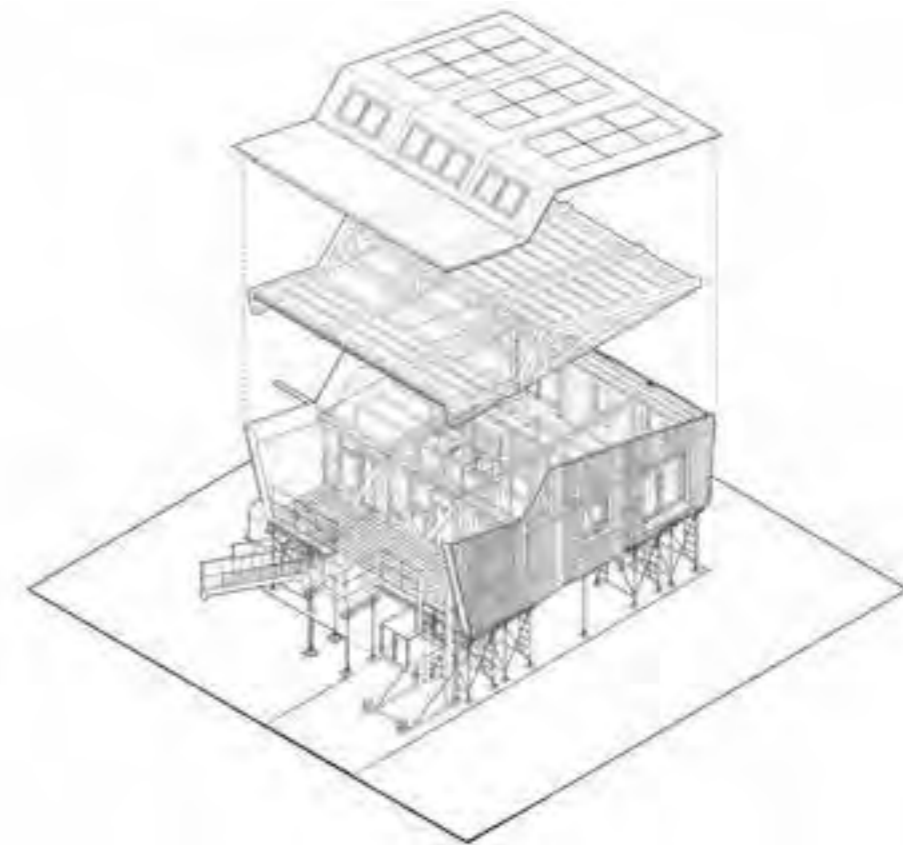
8. all materials and building elements are easily retrievable, the building acts as a material depot
